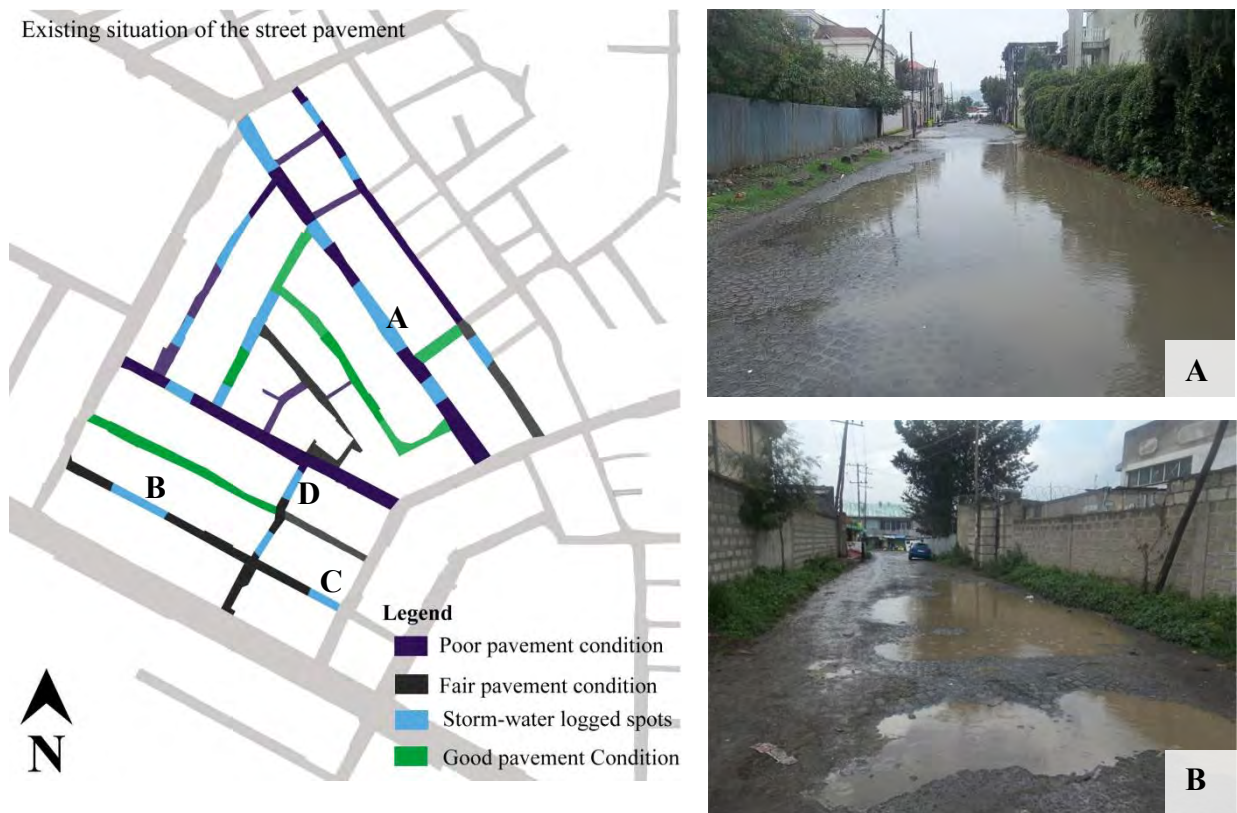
27 Street pavement condition Source: (Source: Author, 2016)
